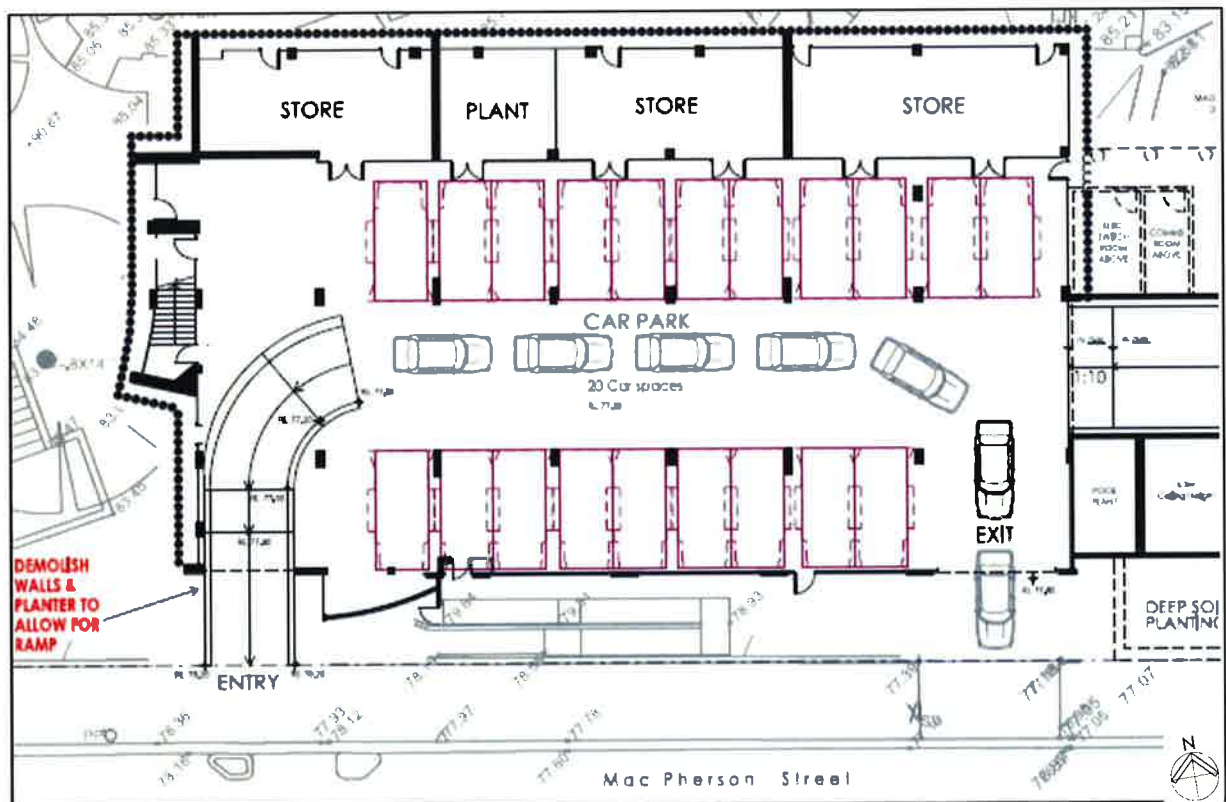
Potential on-site drop-off/pick-up zone within DJSC basement car park
